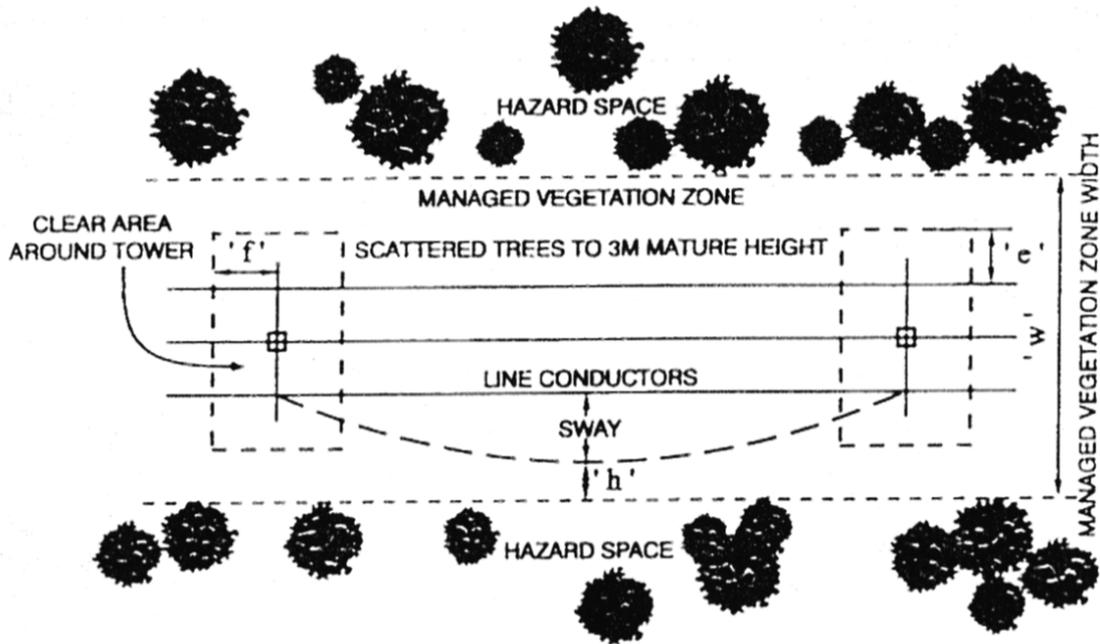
Plan view of managed vegetation zone option for long span (>400m)
